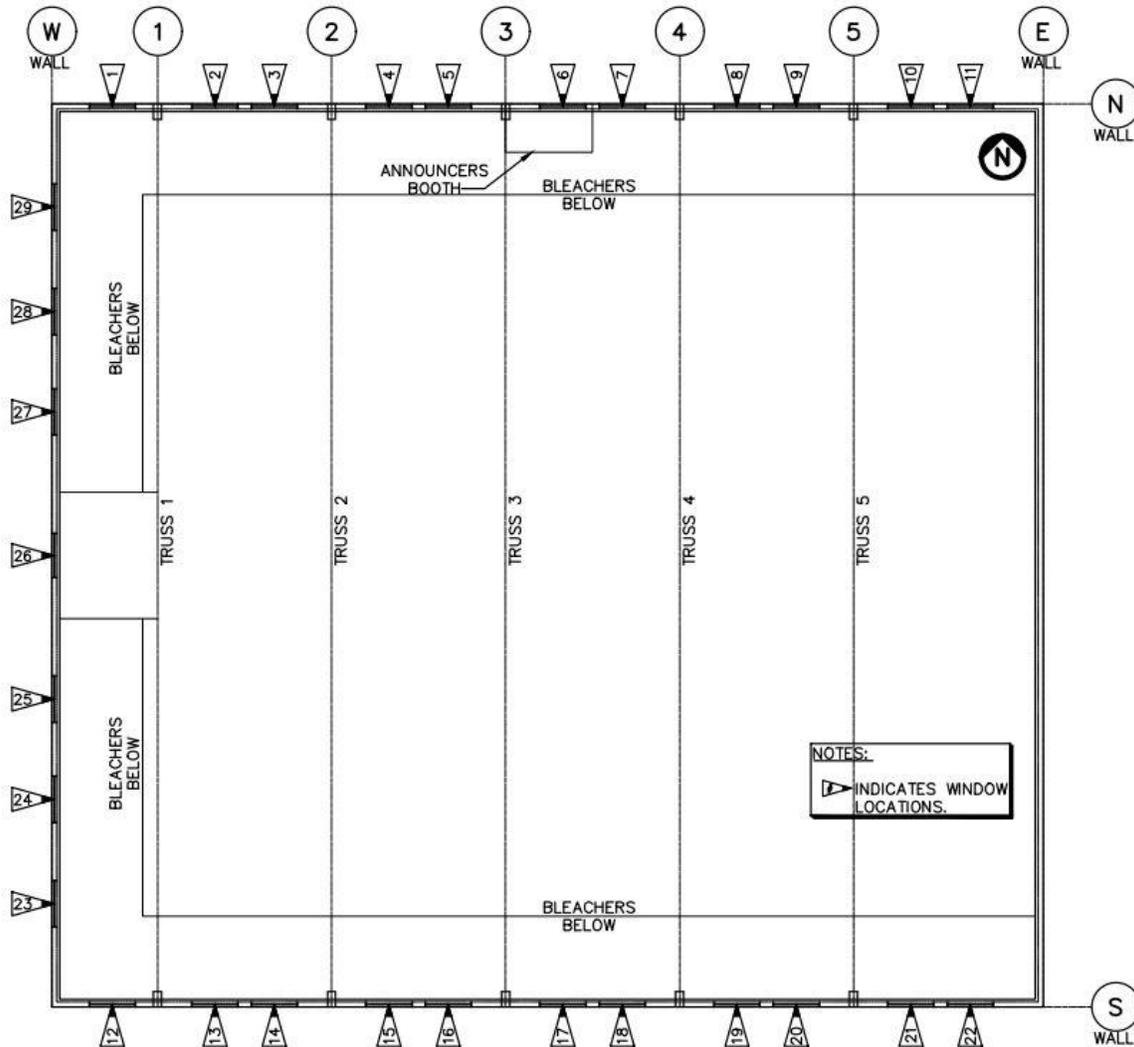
Gym plan view indicating column lines, truss numbers, and window locations.
